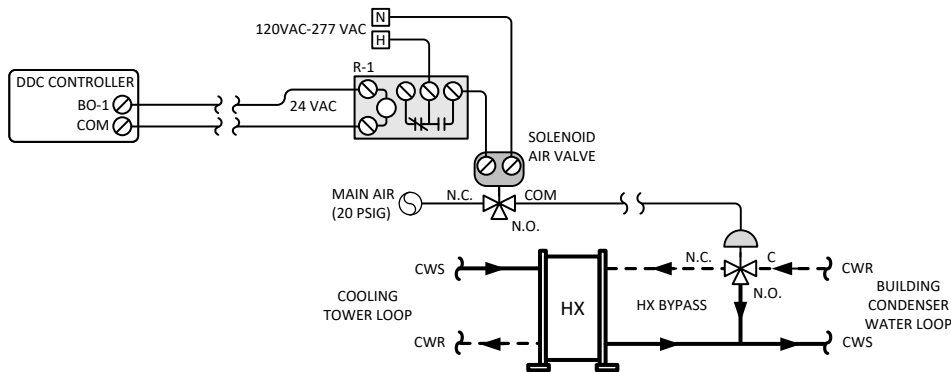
Solenoid Air Valve for Seasonal Diverting Valve Control
